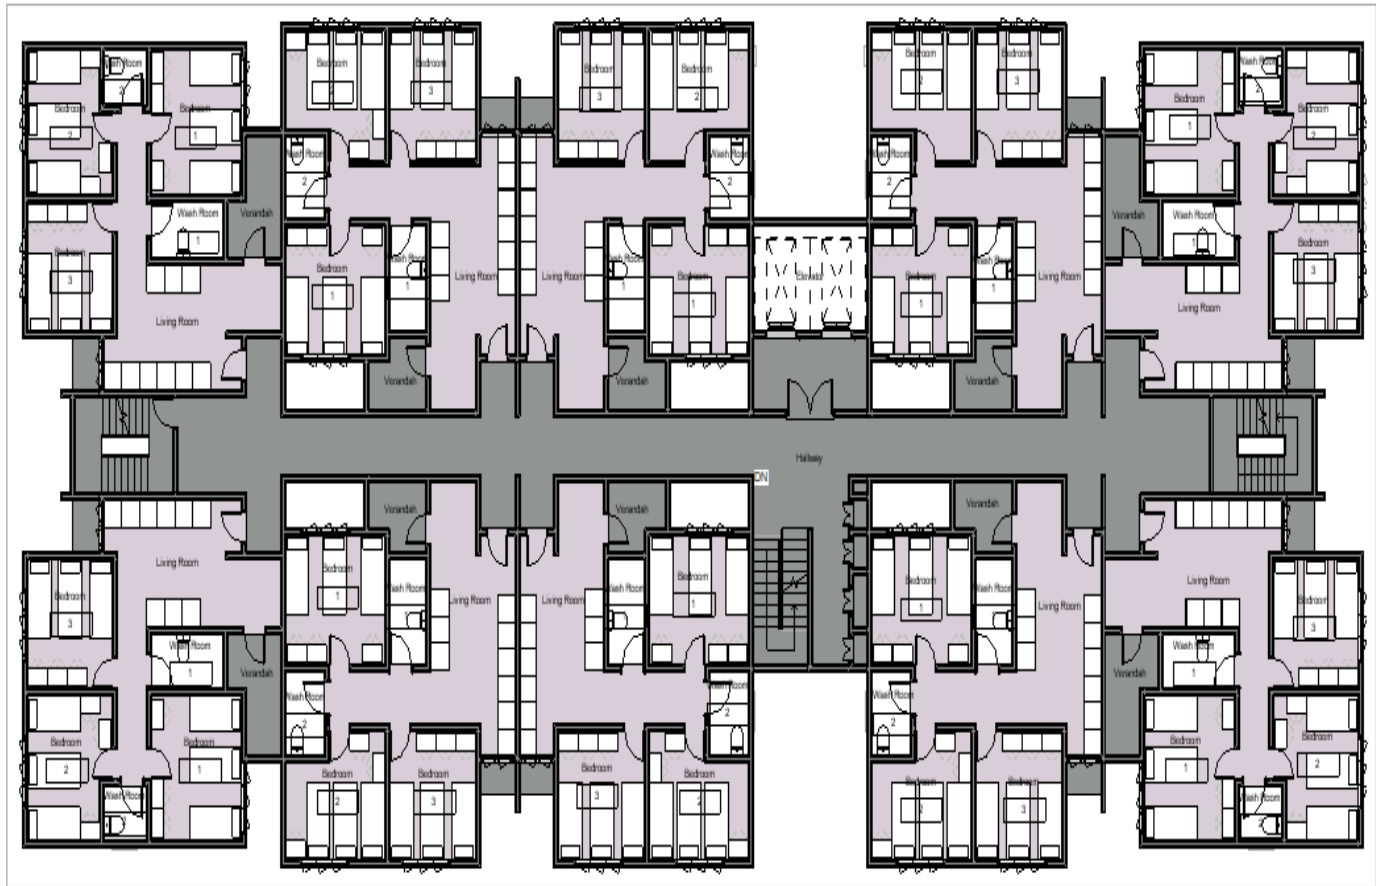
Floor plan from level 1 to 6 including facilities component such as lockers, beds and study desk at Block A3 Uniciti building
